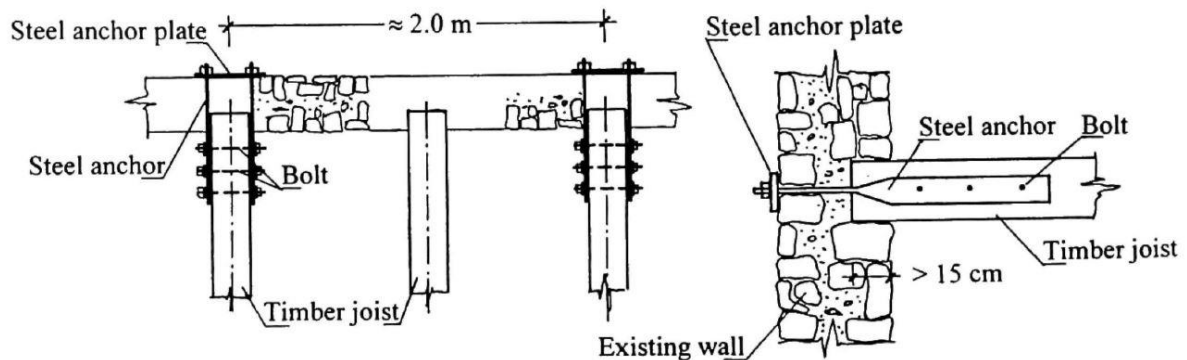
Detail of anchoring of a wooden floor into a stone-masonry wall ([Tomažević, 1999](#)).
